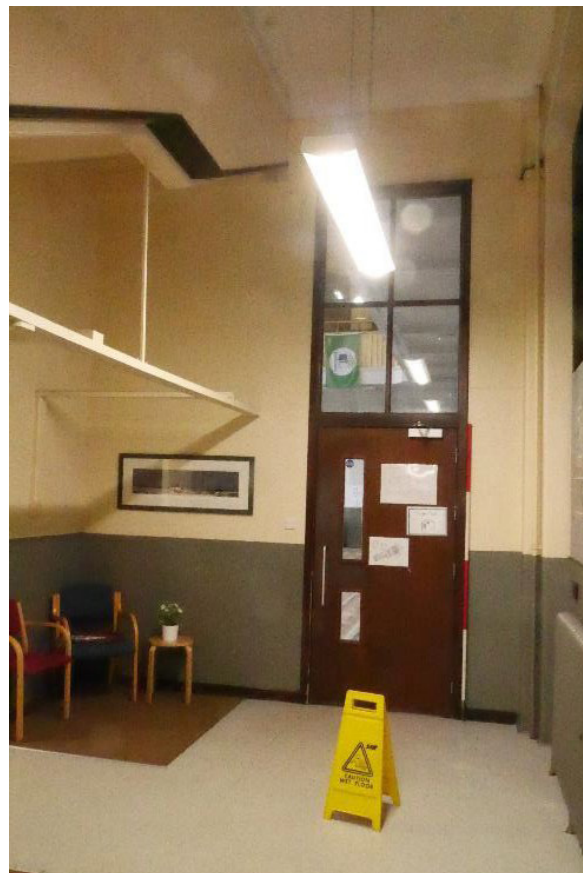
General view of Room 0/6, looking north-east (© Derek Hall 2023)
